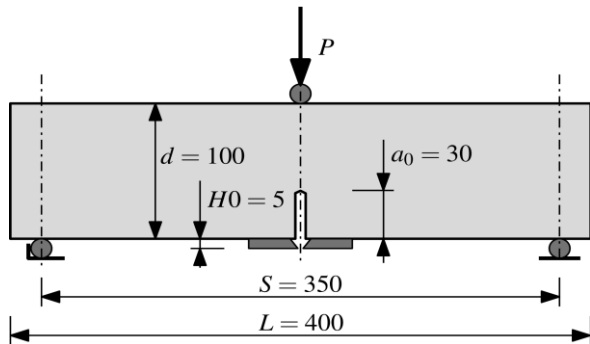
Fracture testing configuration and geometry of specimen with elongated U-notch.
